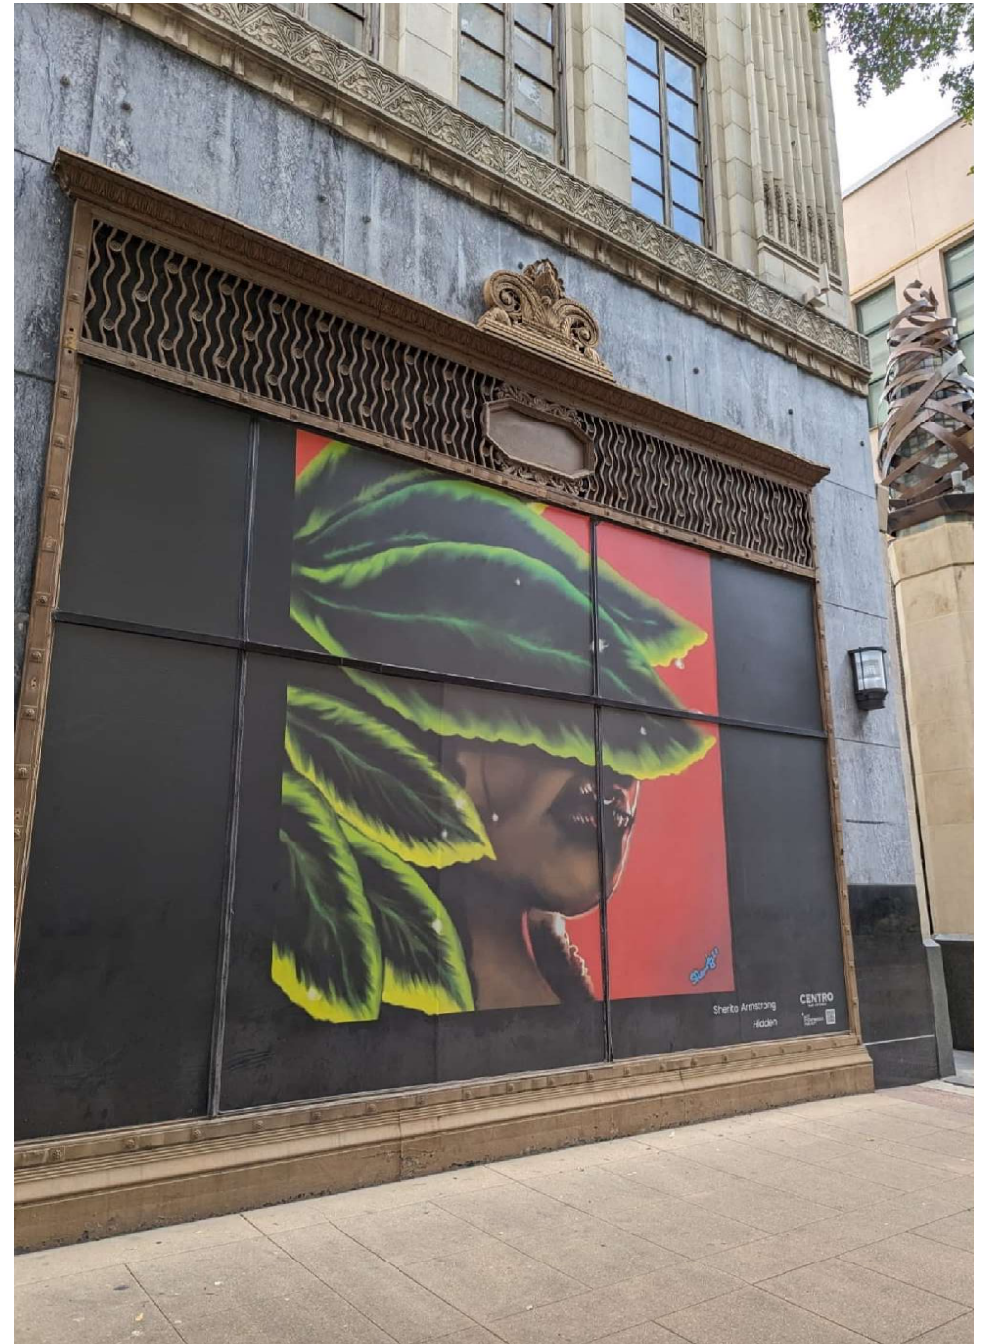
&7: EXISTING ORNAMENTAL IRON WORK DETAILS
